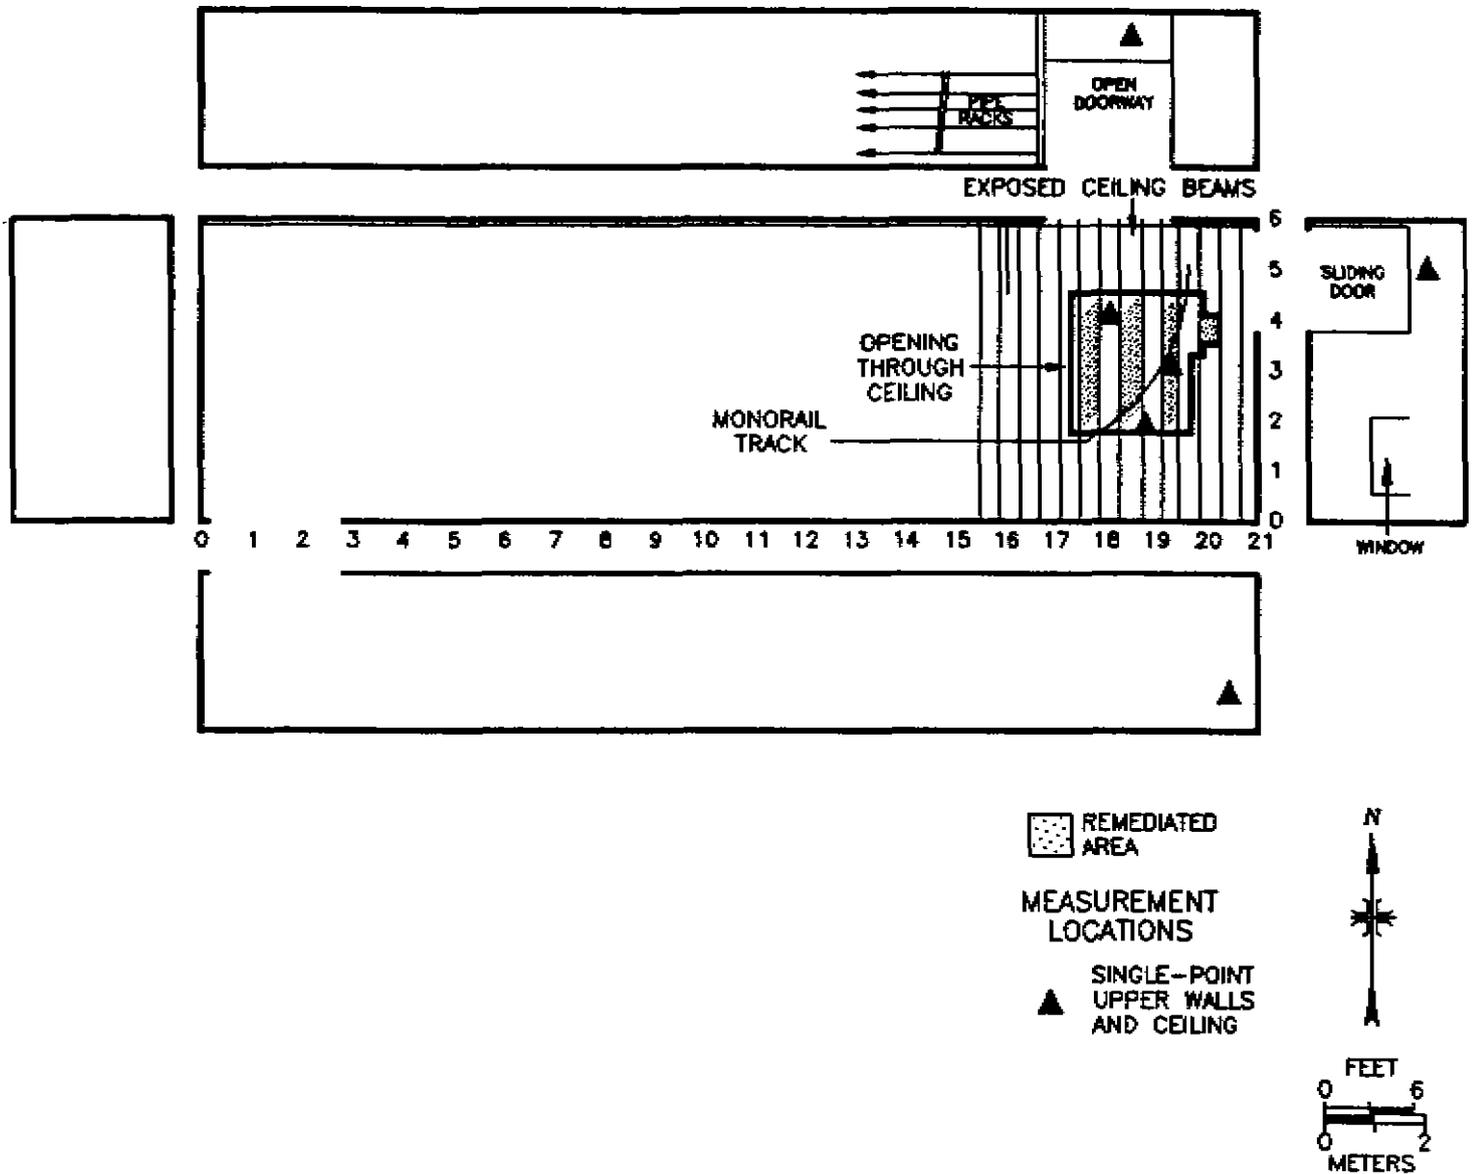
Building 5, Plumbing Shop, Indicating Measurement Locations on Ceiling and Upper Walls
